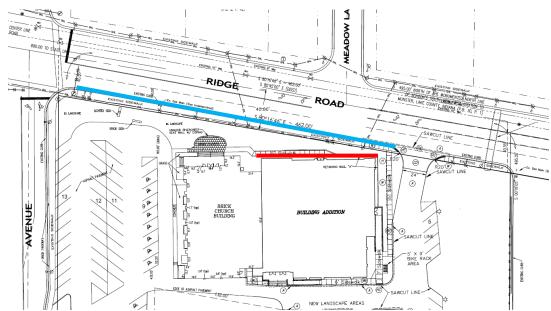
Building facade position shown in red; Ridge Road Frontage line shown in blue
